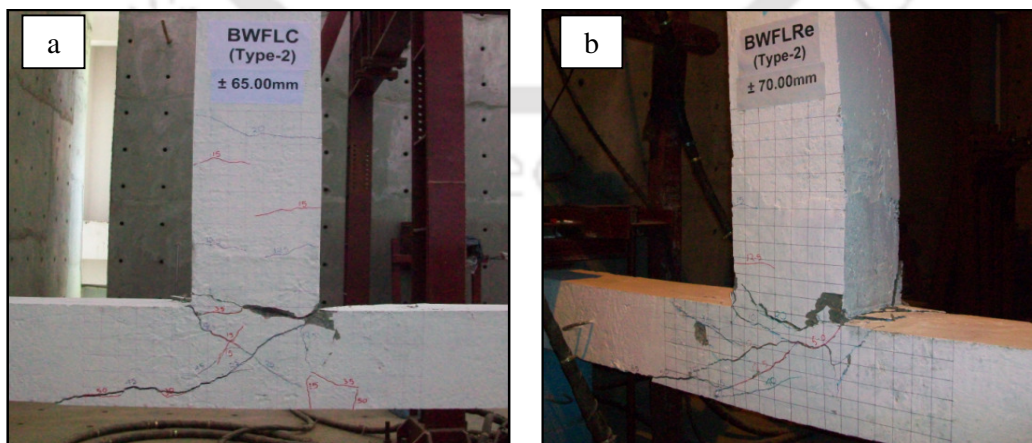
BWFL specimens at the end of test under loading type-2:
